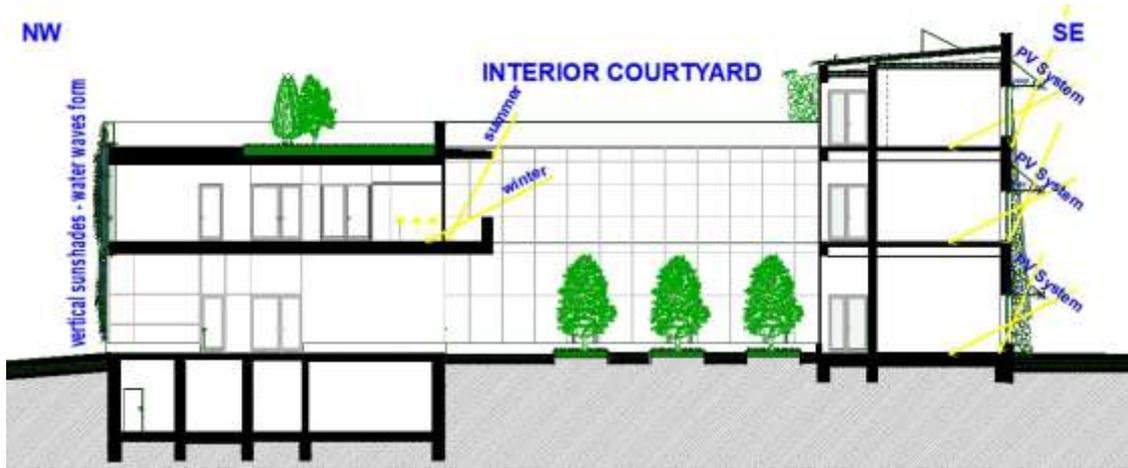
Section with metal structures designed for actual horizontal sunshades and a potential future photovoltaic system on the South-East elevation and vertical sunshades on water waves form on North West elevation (2)
